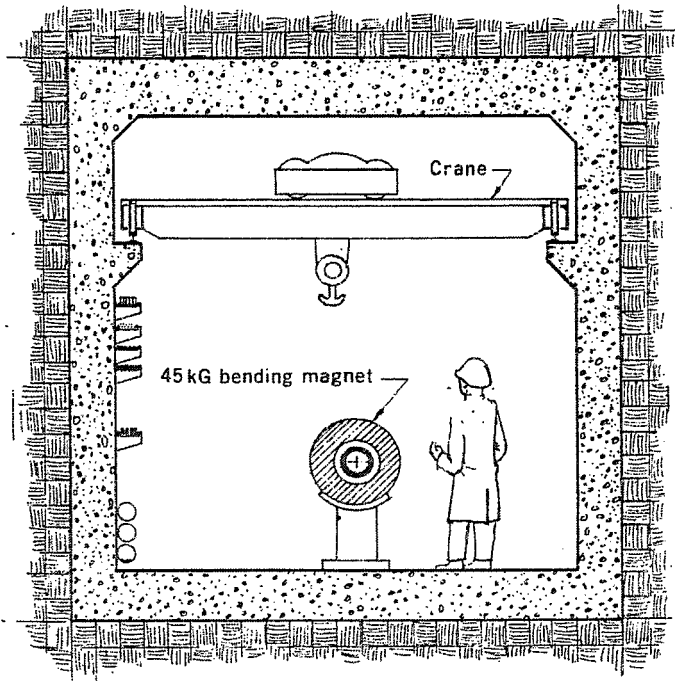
A typical tunnel cross section showing a 45 kG magnet installed in the tunnel.
